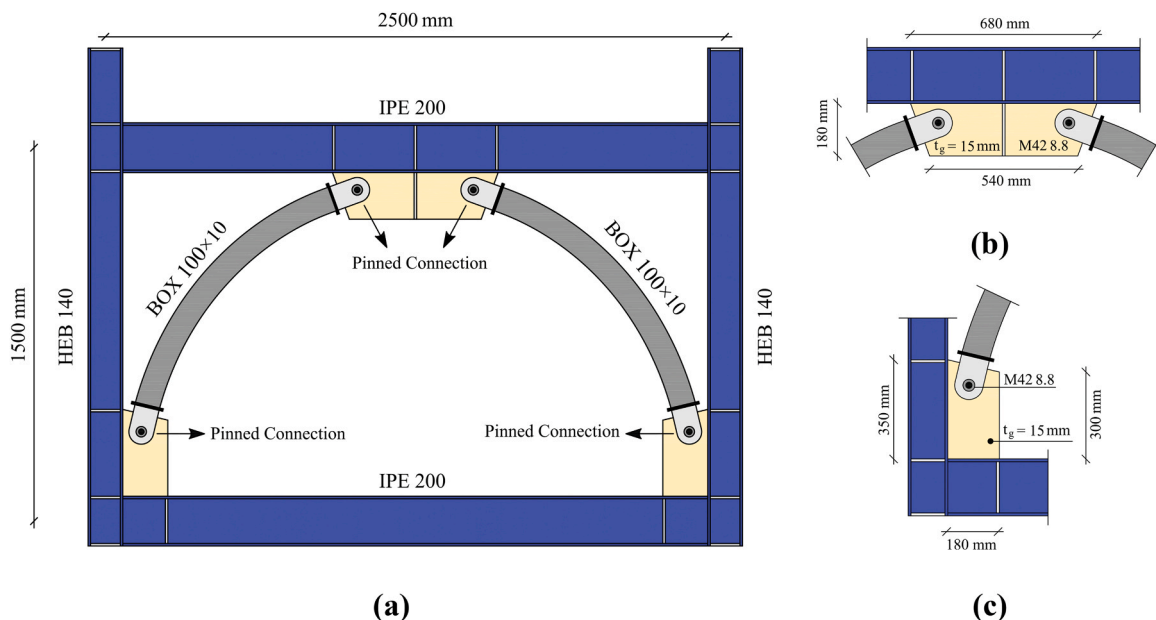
Half-Elliptical-Braced Steel Moment Frames (HEB-MFs); (a) elevation view, (b) mid-span gusset plate, (c) corner gusset plate.
